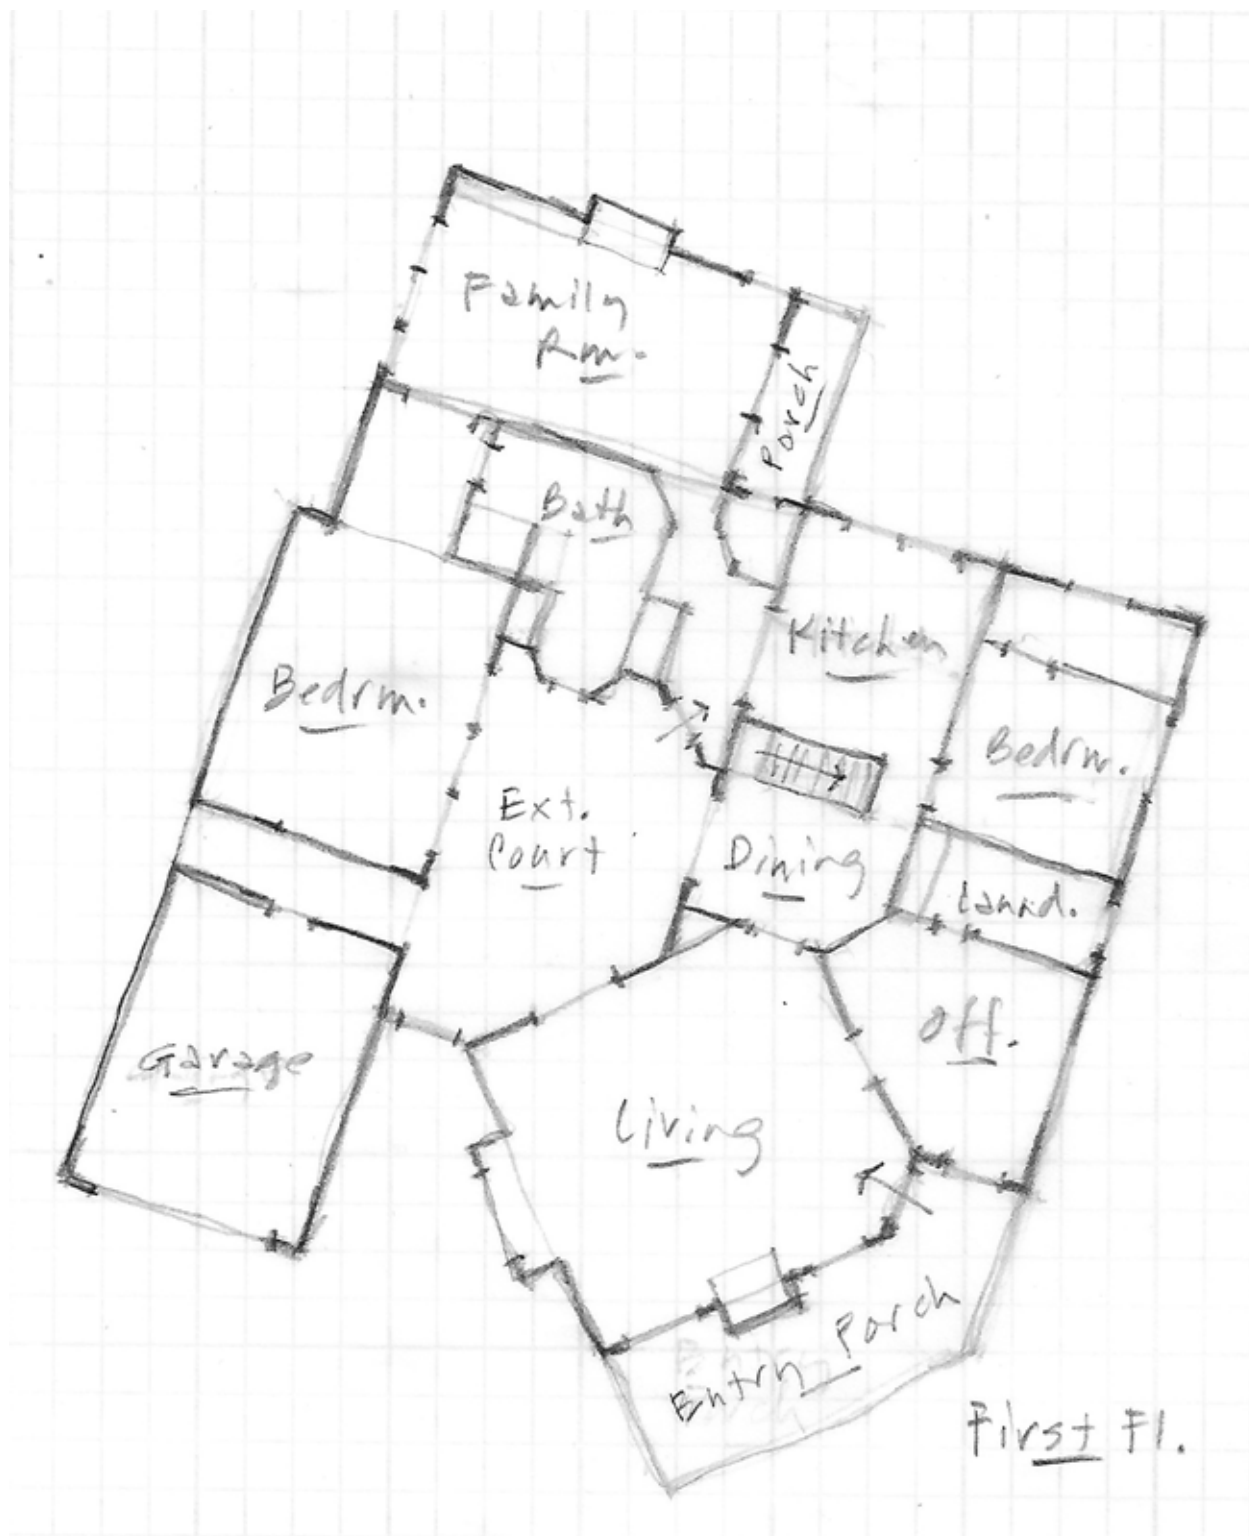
1850 Alameda Diablo – First floor plan (south is up)
